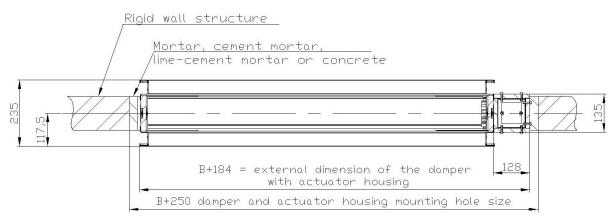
Installing method of WKP-P fire dampers in rigid wall, baffle axis should be in line with wall axis
